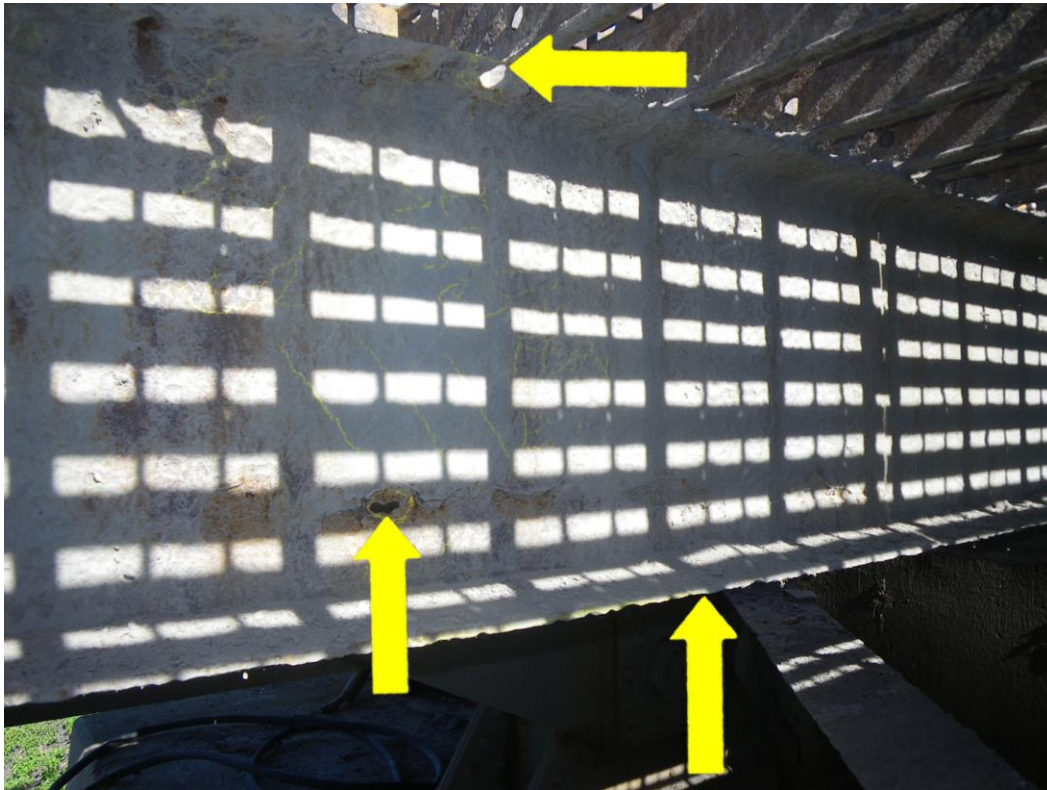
Stringer S8 at 5'-6" from Floorbeam FB0N, East Face, Span 1 - Section loss of flanges and web including areas of 100% section loss. Note top flange 100% section loss encompasses a vacant drilled hole.
